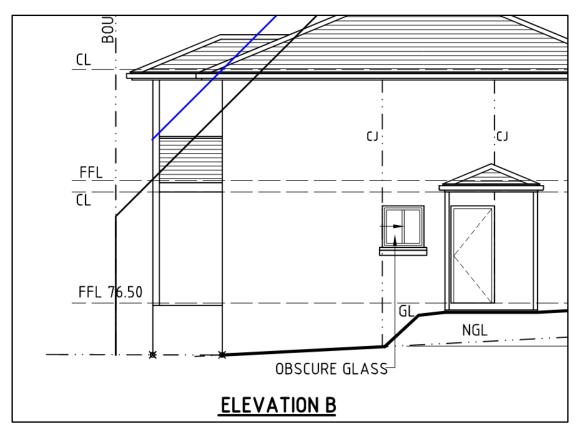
Elevation showing building envelope relative to bulk of dwelling (black) and building envelope relative to the roofed deck (blue).
